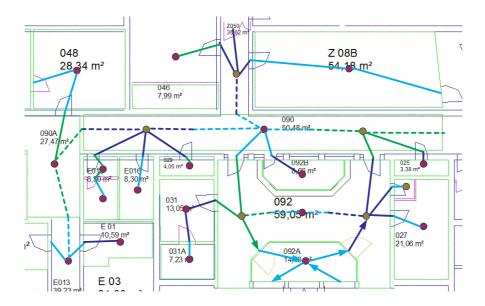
Floor Plan Overlaid with Cell Centres and a Path System
